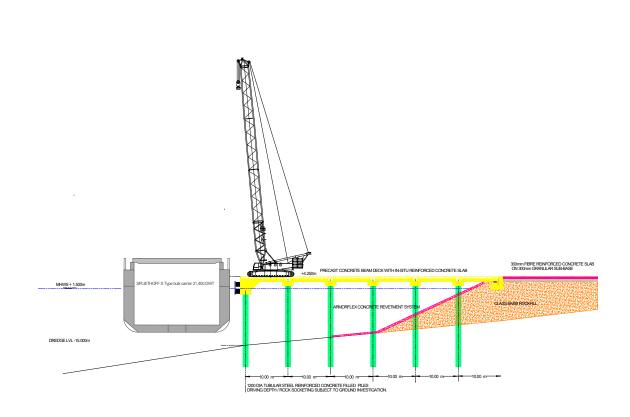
Sectional Elevation of Proposed Quay Construction Sequence
